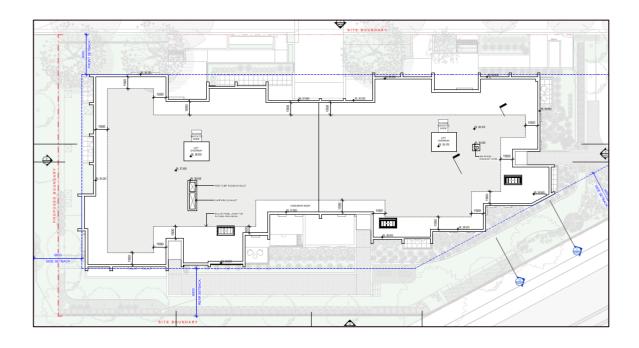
Roof Plan. Source: WMK Architecture, dated 18 October 2024
